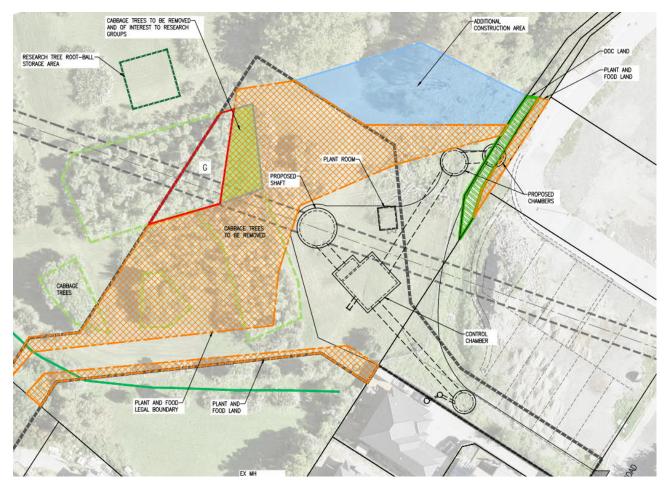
Proposed site works showing proposed infrastructure (Source: Watercare, 2021).
